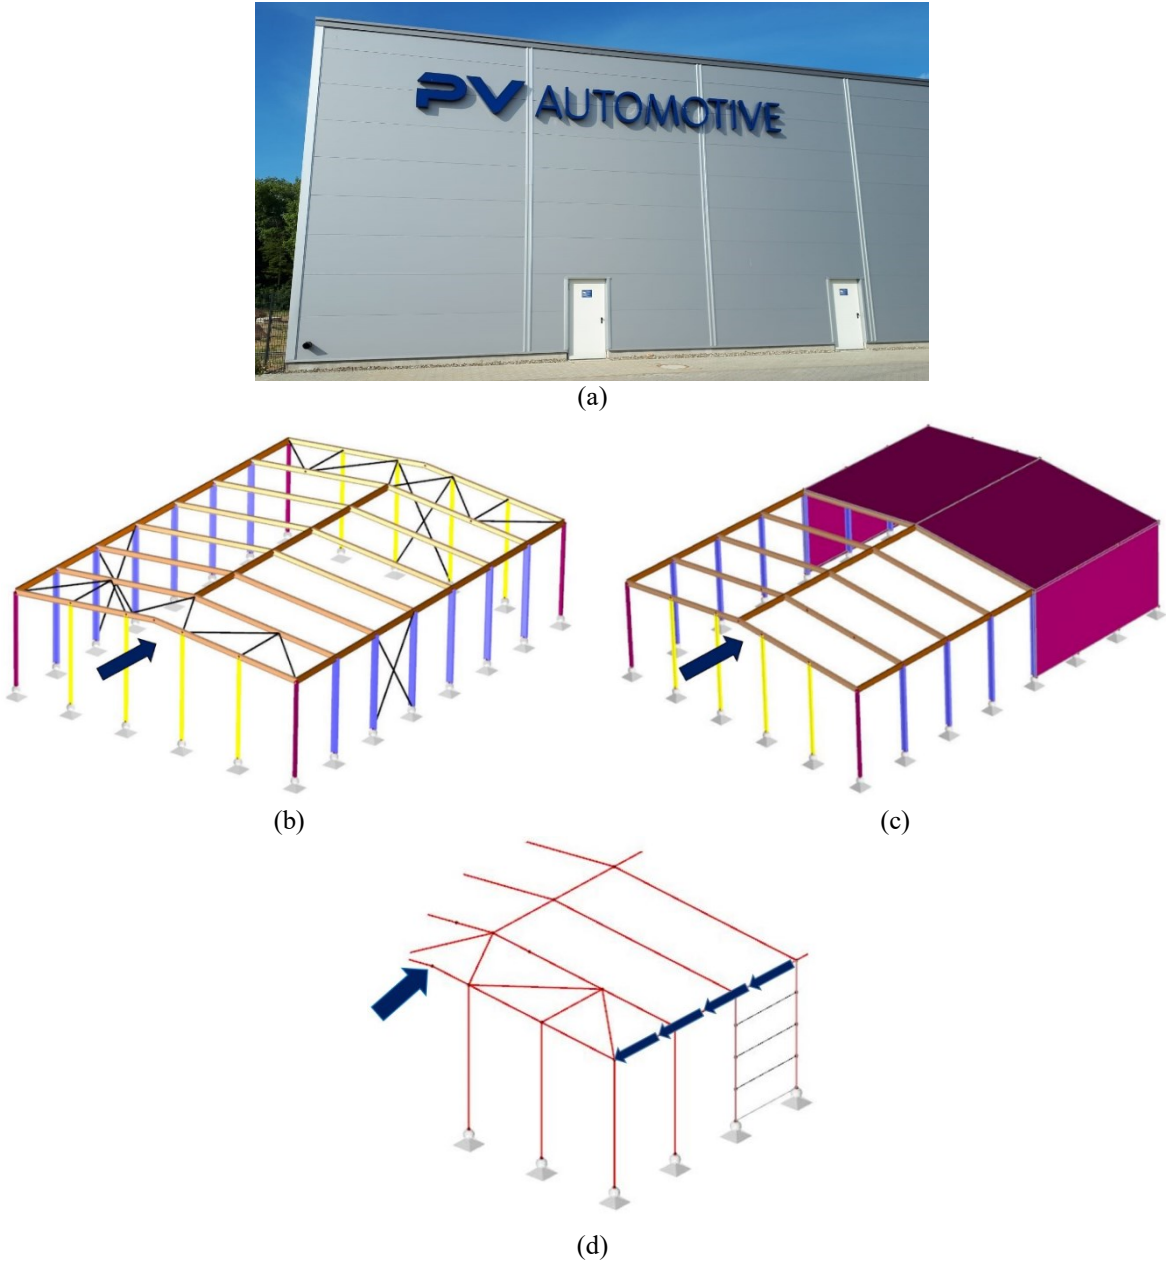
Portal frame structure: a) horizontal panels in practice, b) without steel claddings with the bracing system, c) without bracing system with steel claddings, d) reaction to the lateral force
